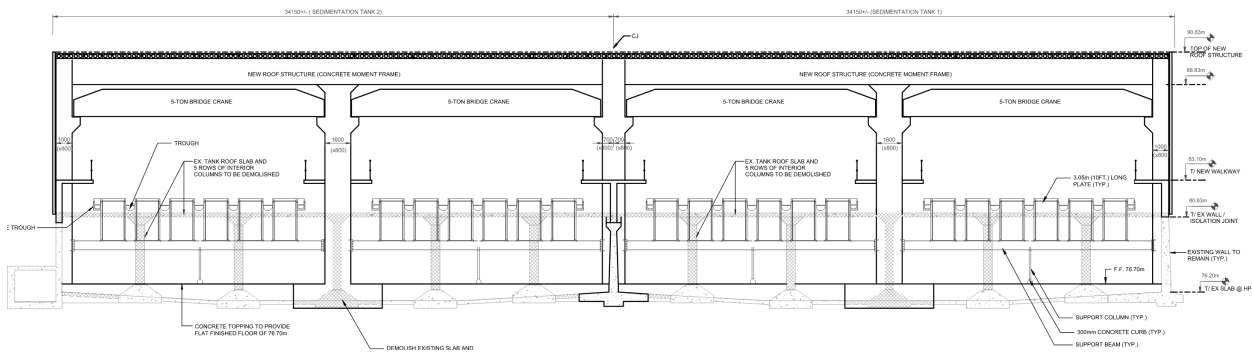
Proposed Sedimentation Tank Structural Works (Source: AECOM Conceptual Design, 2021)
